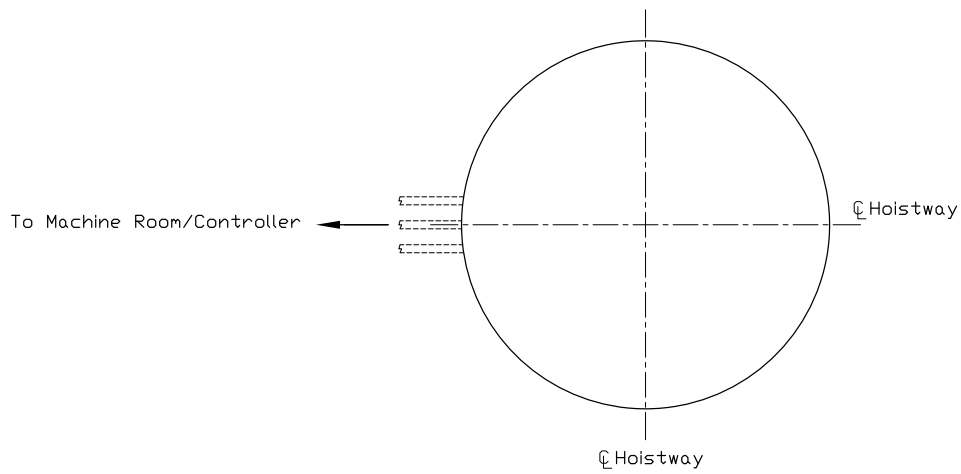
Machine room layout and wire routing (acrylic/glass) - type 1 or 2
